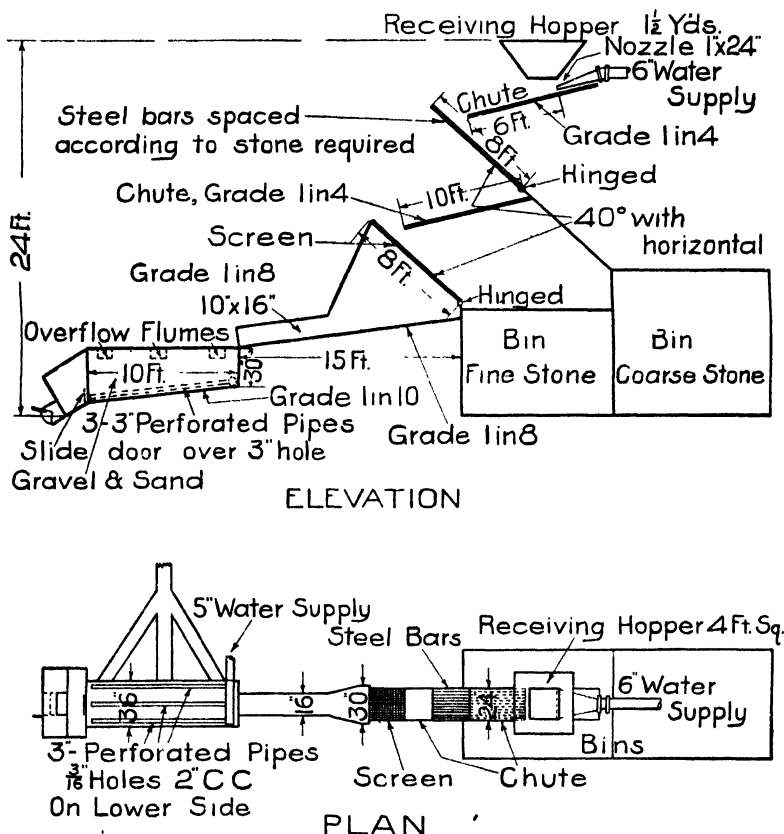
Washing and Screening Plant. (See p. 229.)
